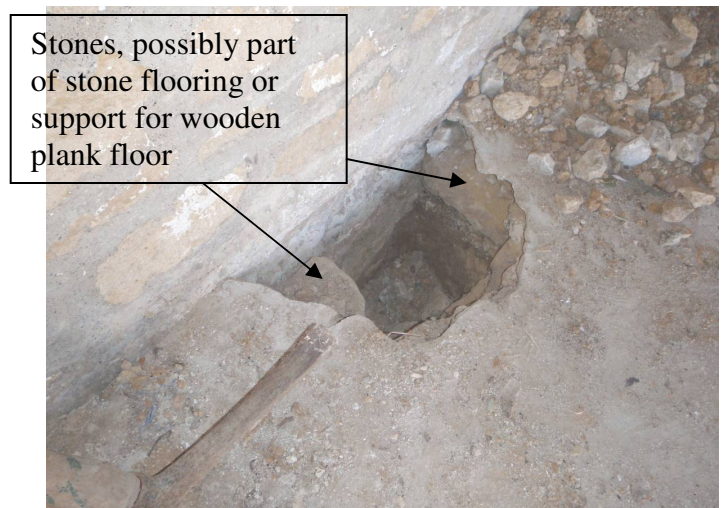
Detail of exploratory hole in flooring inside barn, looking southwest
